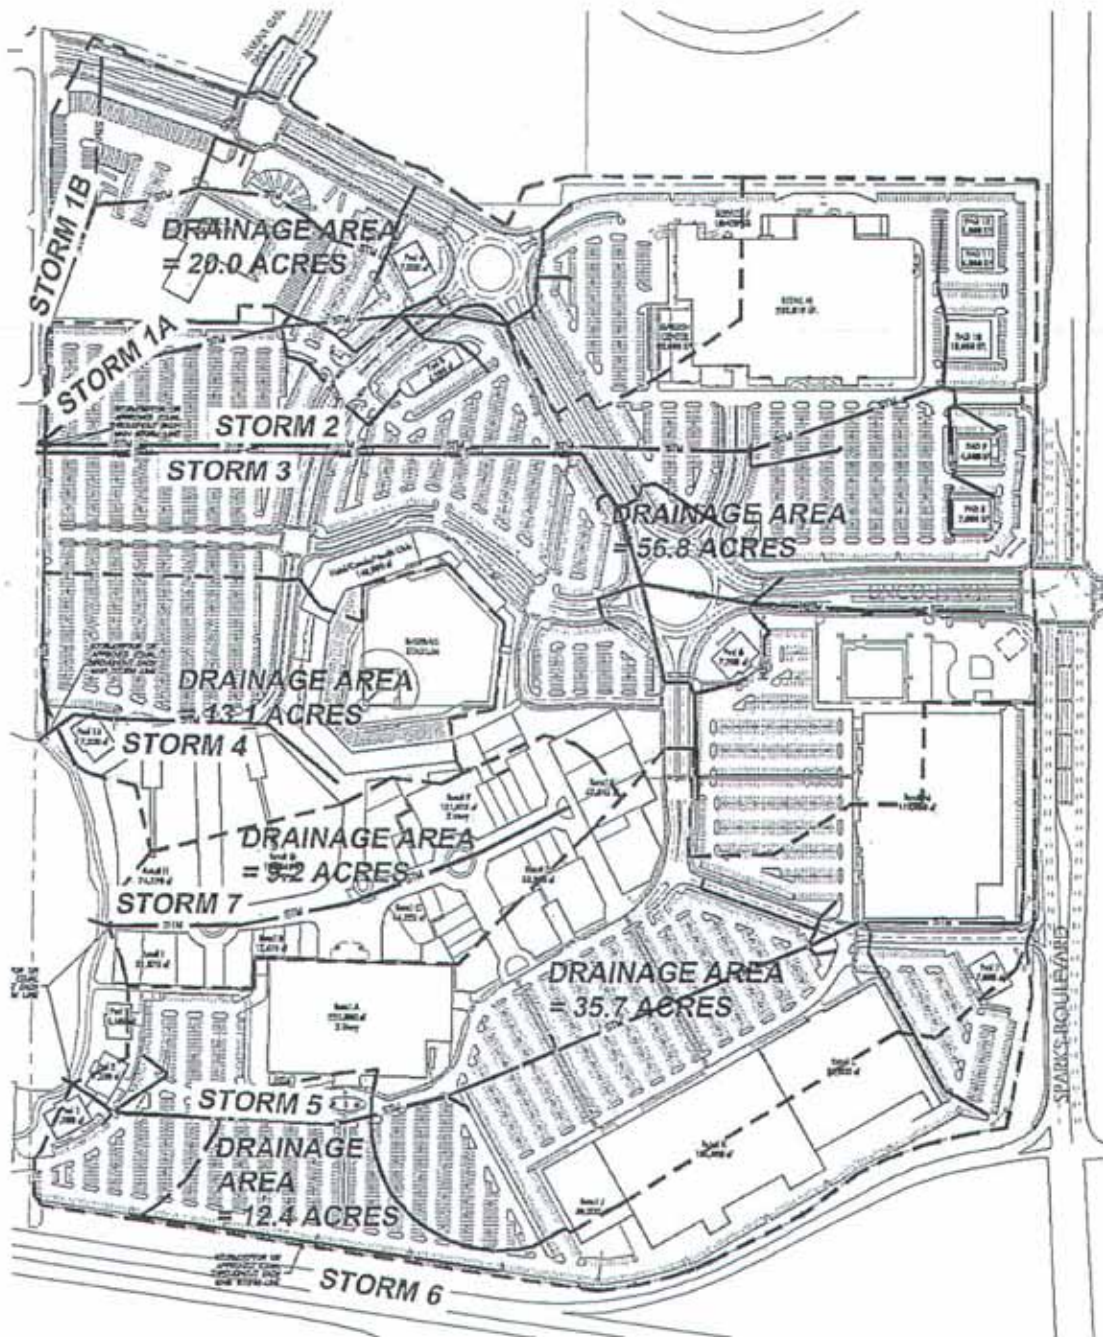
Major Storm Sewer Lines and Drainage Areas
